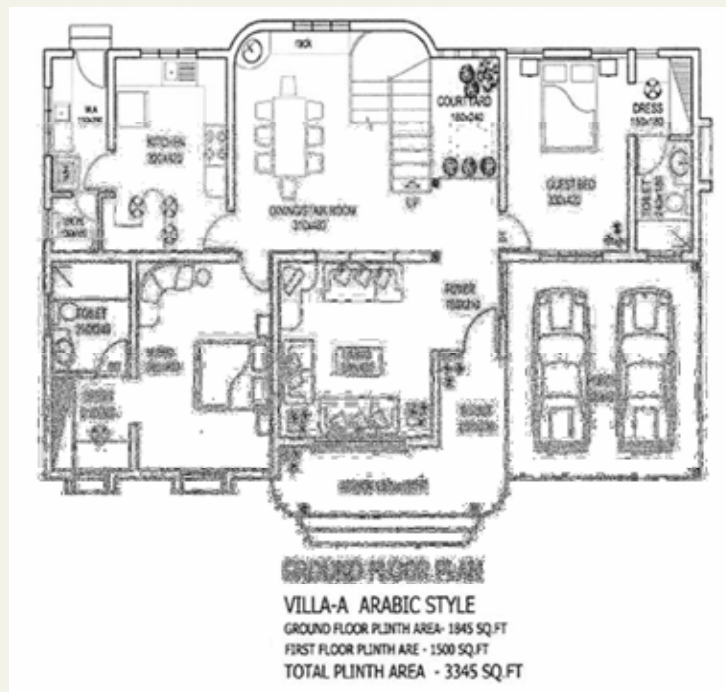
Example of Villa Floor Plan (SRK, 2012)
